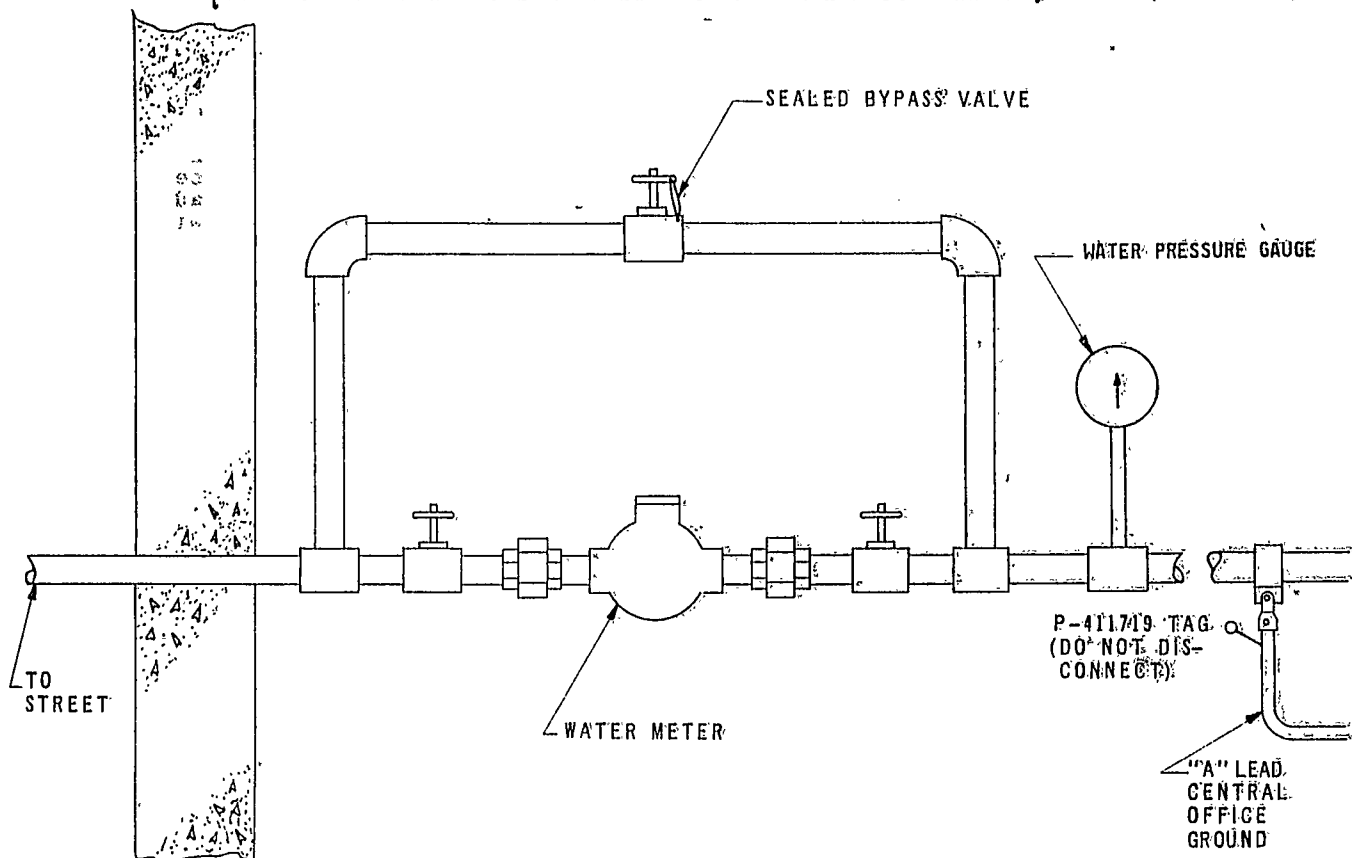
WATER PIPE WITH BYPASS ARRANGEMENT. GROUND CONNECTION WHERE WATER METER IS OUTSIDE OF BUILDING OR WHERE IT IS NOT ECONOMICAL TO CONNECT "A" LEAD TO STREET SIDE OF METER, AND BOND AROUND METER IS NOT REQUIRED. (PARS. 5.45)
